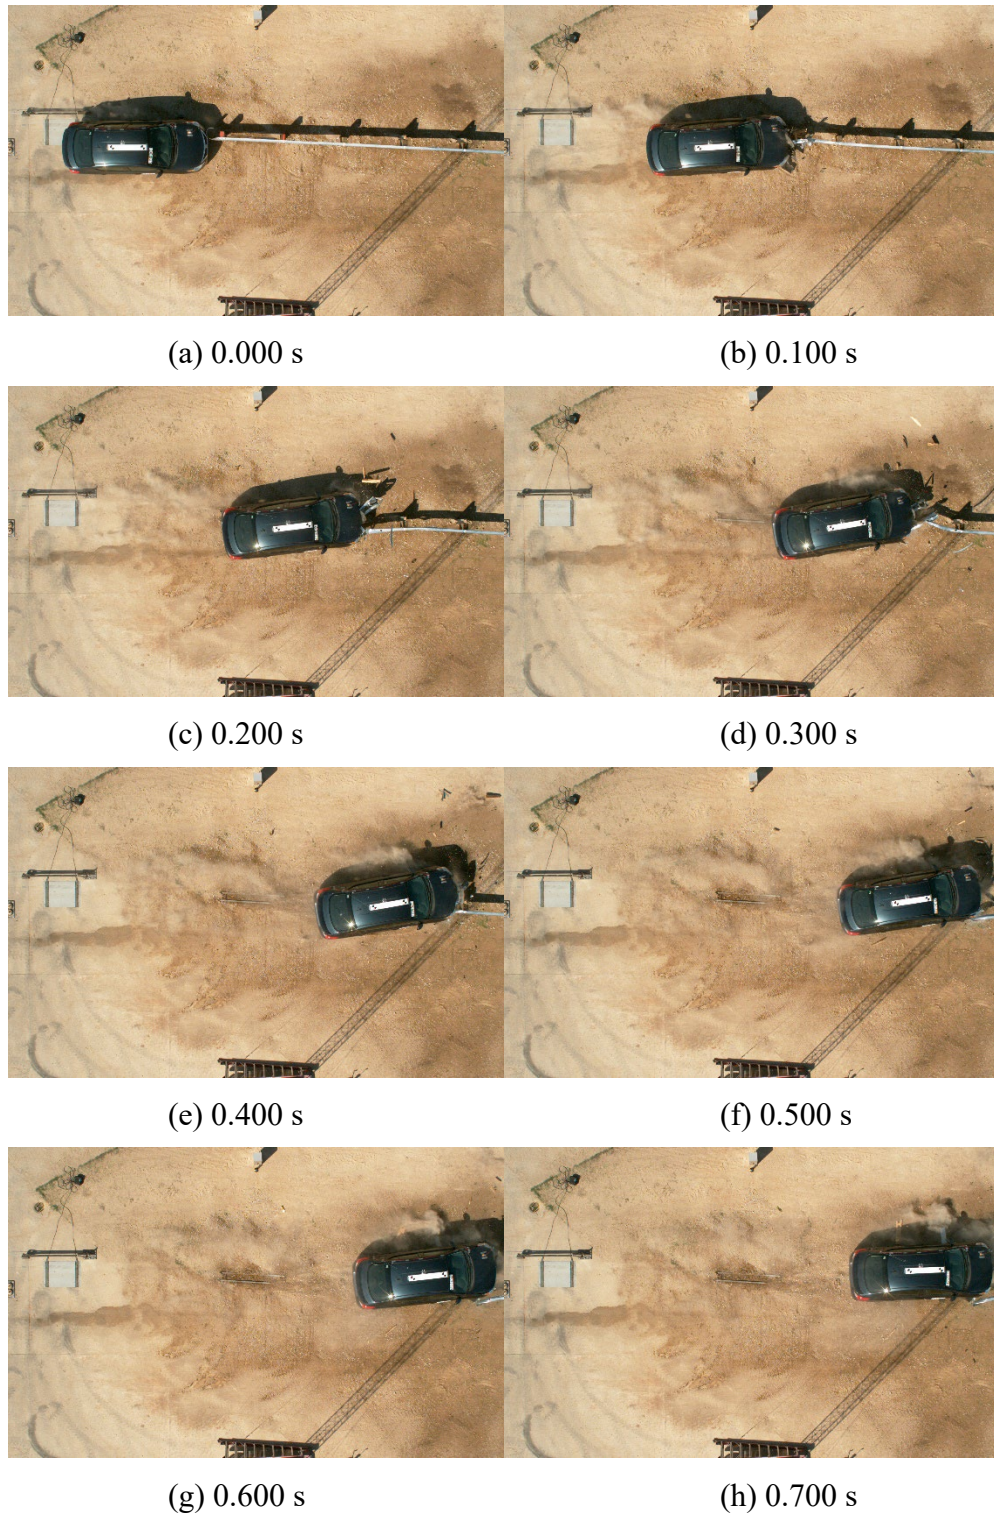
Sequential Photographs for Test No. 615181-01-11 (Overhead Views).
